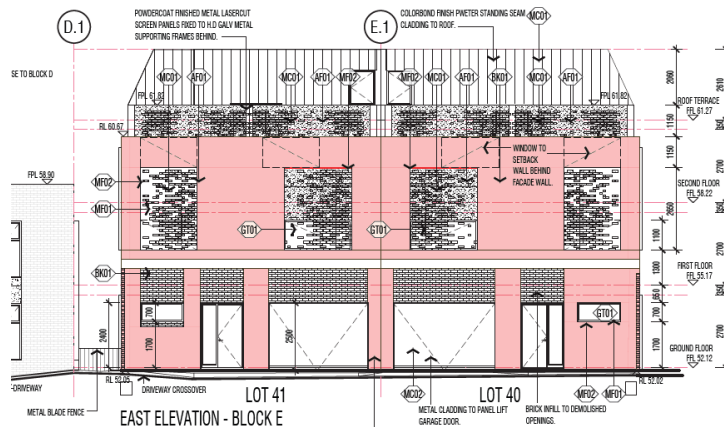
Approved East Elevation (Hardy Street frontage) of Development
